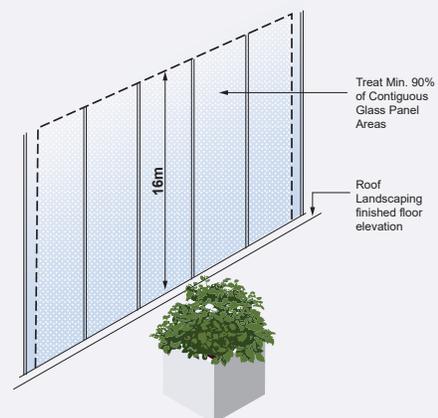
Bird-friendly treatment provided from finished floor elevation of the rooftop landscaping level
